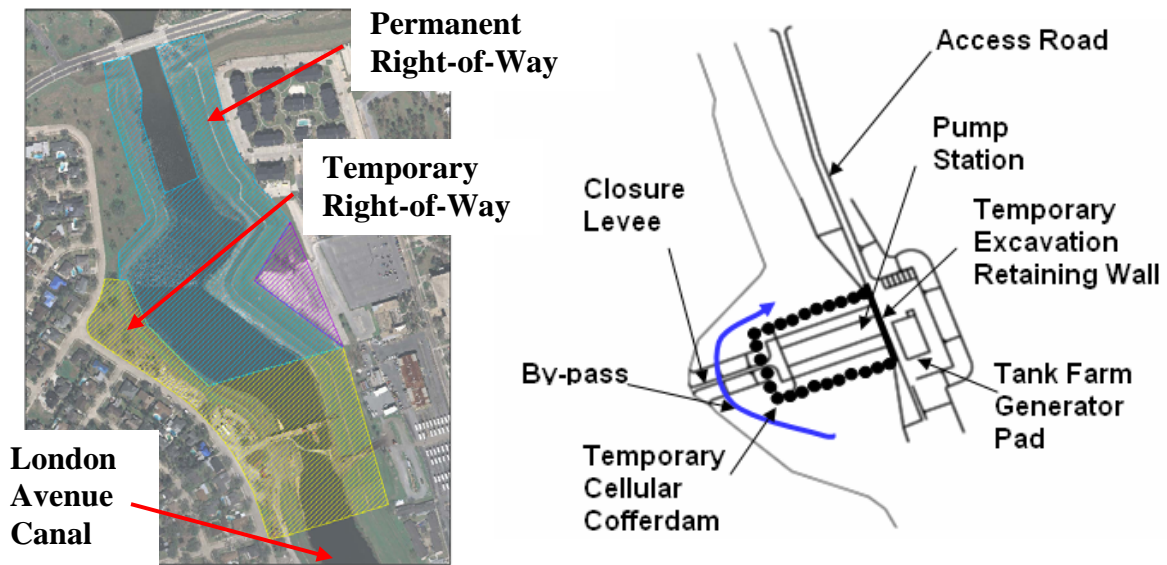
London Avenue Canal Proposed Permanent Protection Location C
